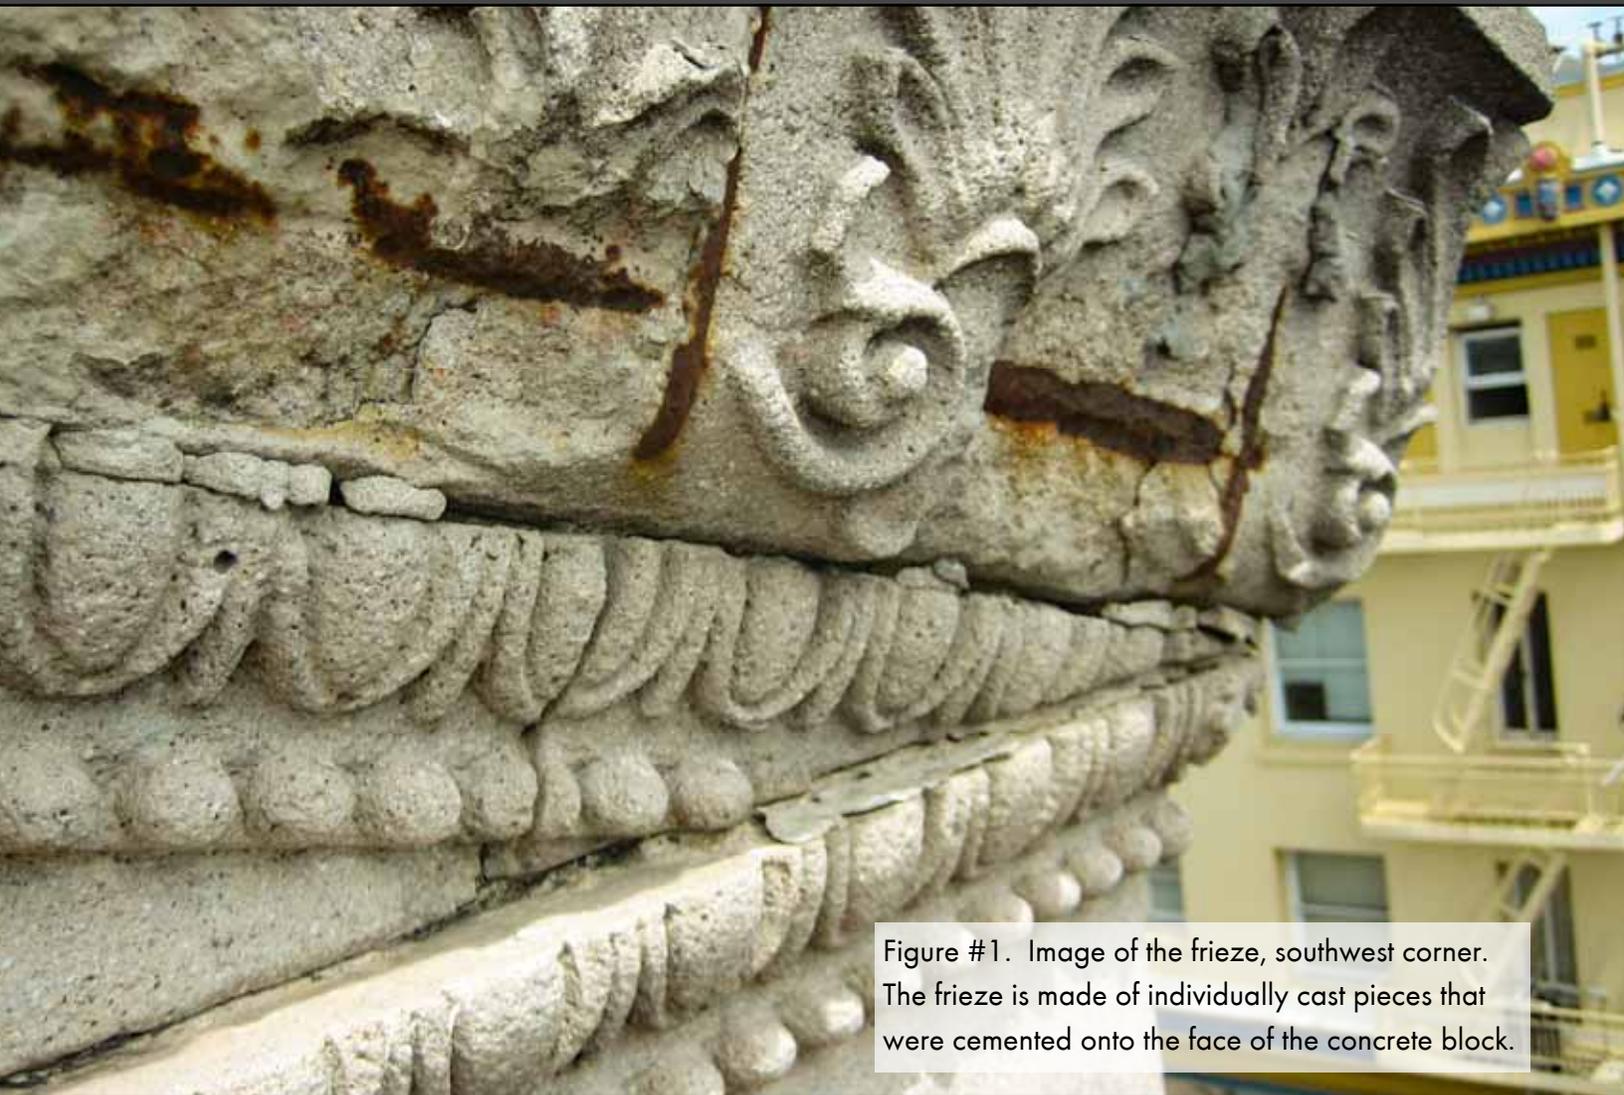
Image of the frieze, southwest corner. The frieze is made of individually cast pieces that were cemented onto the face of the concrete block.
